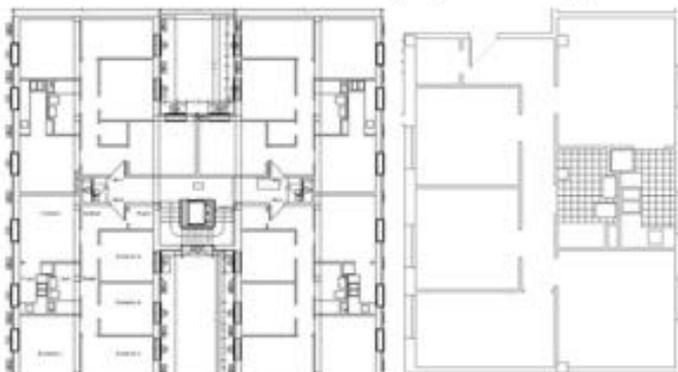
Floor plan of the building (left picture) and of a dwelling (right picture).
